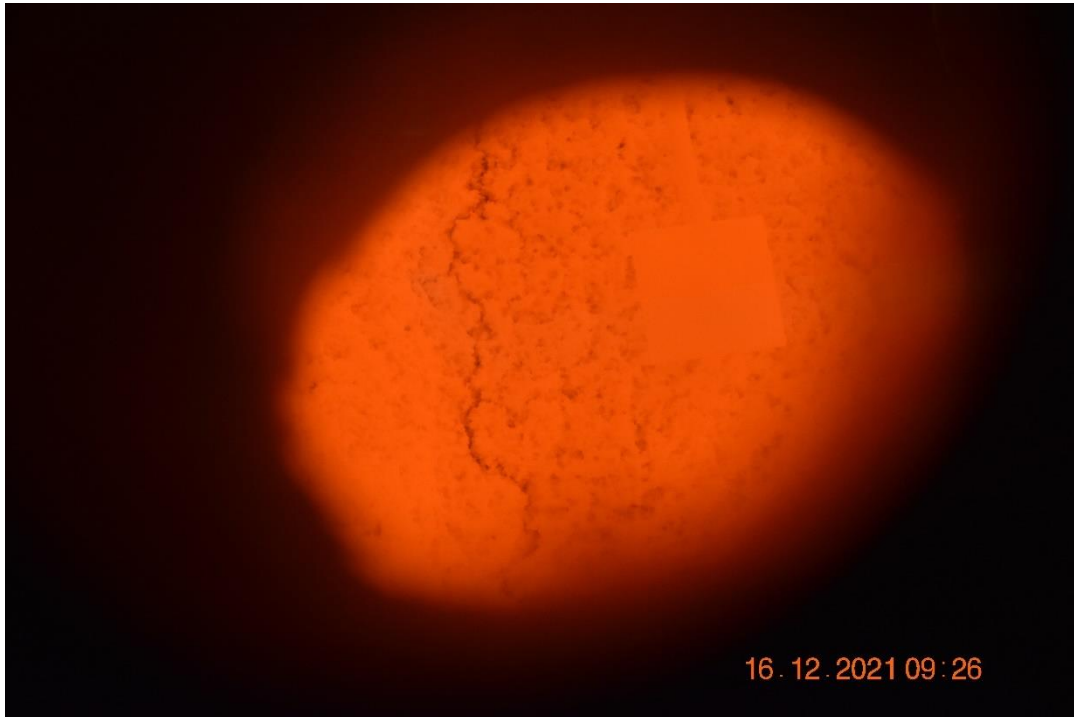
Crack in insulation exposed side after 70 minutes of testing.
